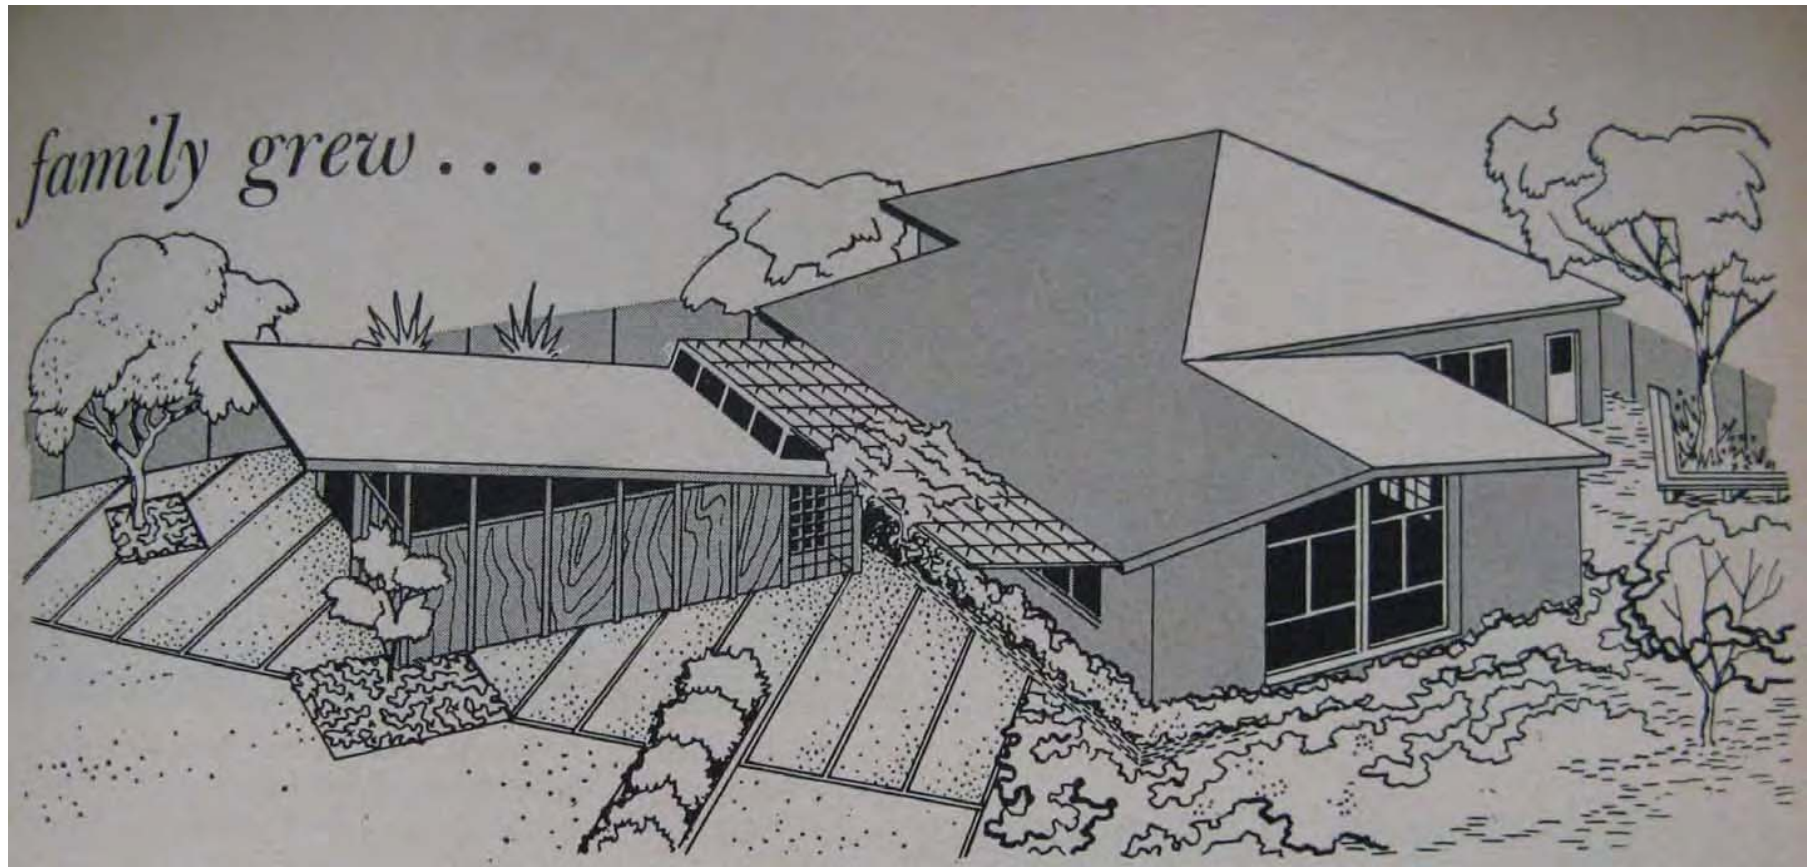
Smith Residence, as of 1954. In 1951, a third bedroom was joined to the adjacent 1941 bedroom, forming a wing capped with a side gable. In the final stage of construction in 1962, Smith extended the living room and added the studio in the lot's northeastern corner. Source: *Sunset Magazine*, April 1954.
